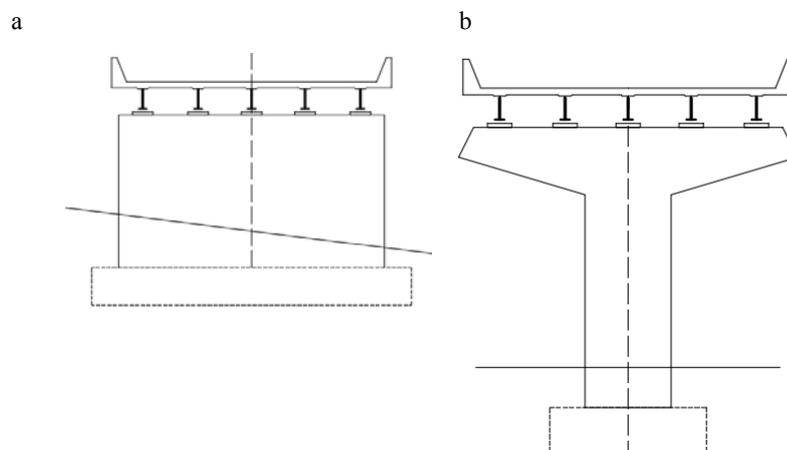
Piers with various types of cross-sections: a – solid pier, b – hammerhead pier
